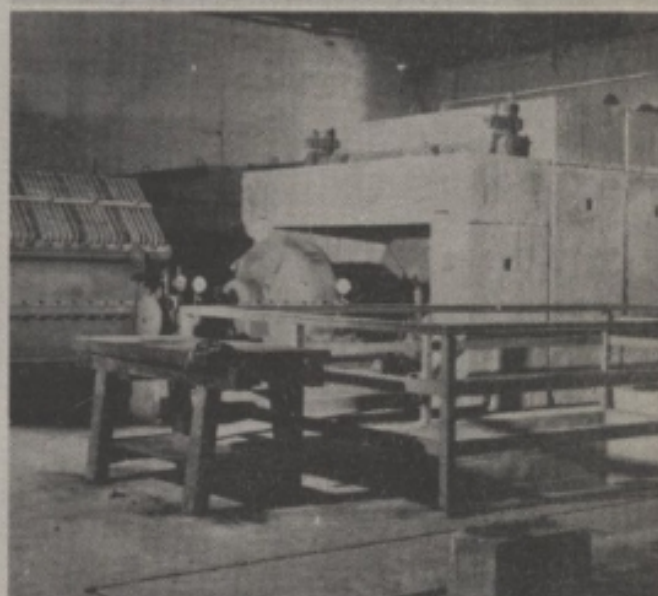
Oberwiesenfeld. Heavy precast concrete blocks used to protect generator.
